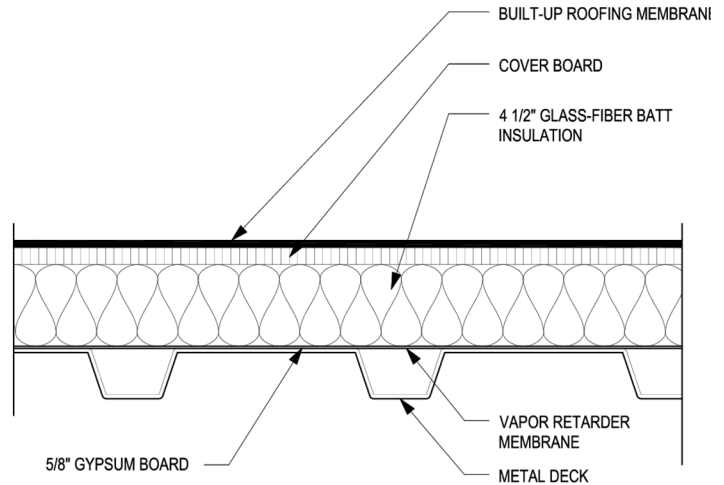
Typical roof construction assembly based on ASHRAE 90.1-2010 minimum standards
